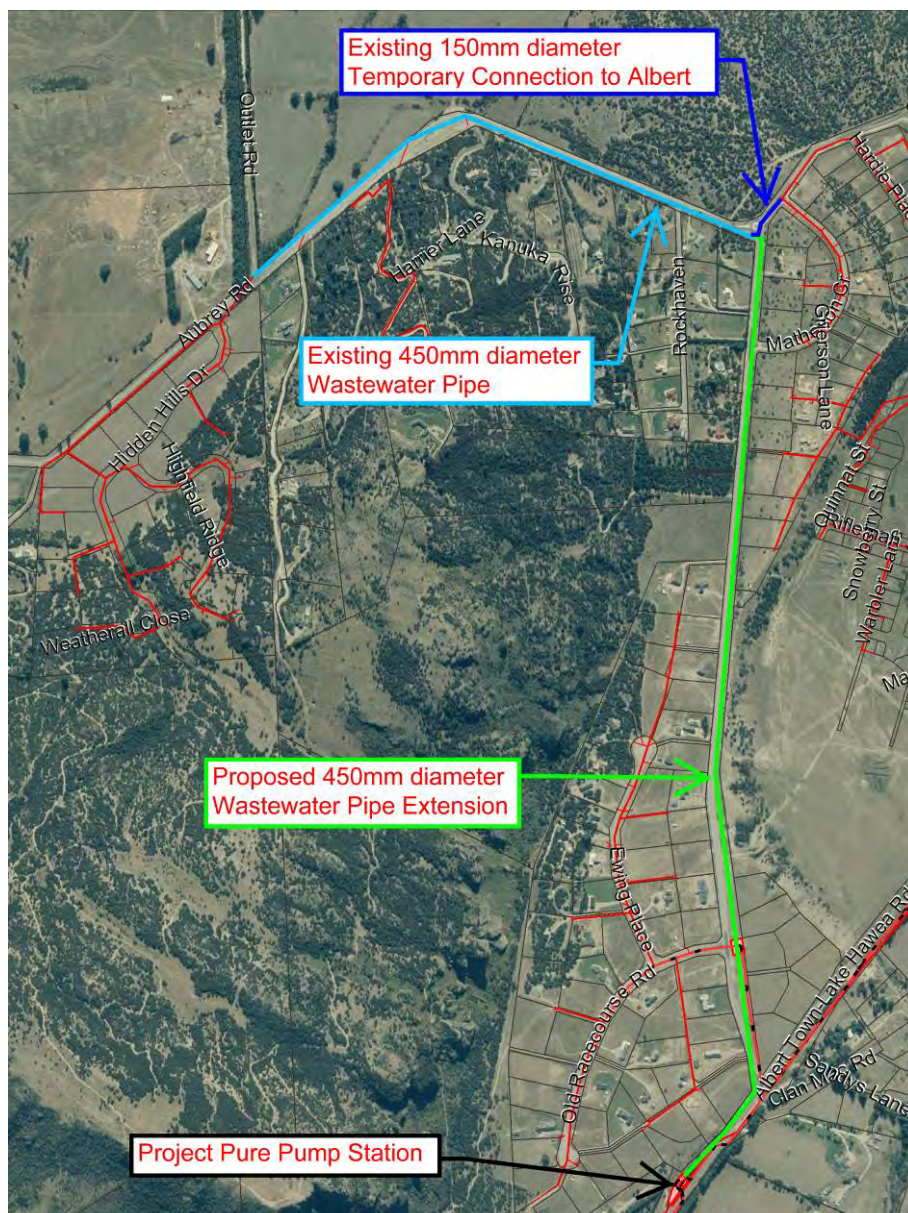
Existing and Proposed Wastewater Reticulation in Aubrey Road
